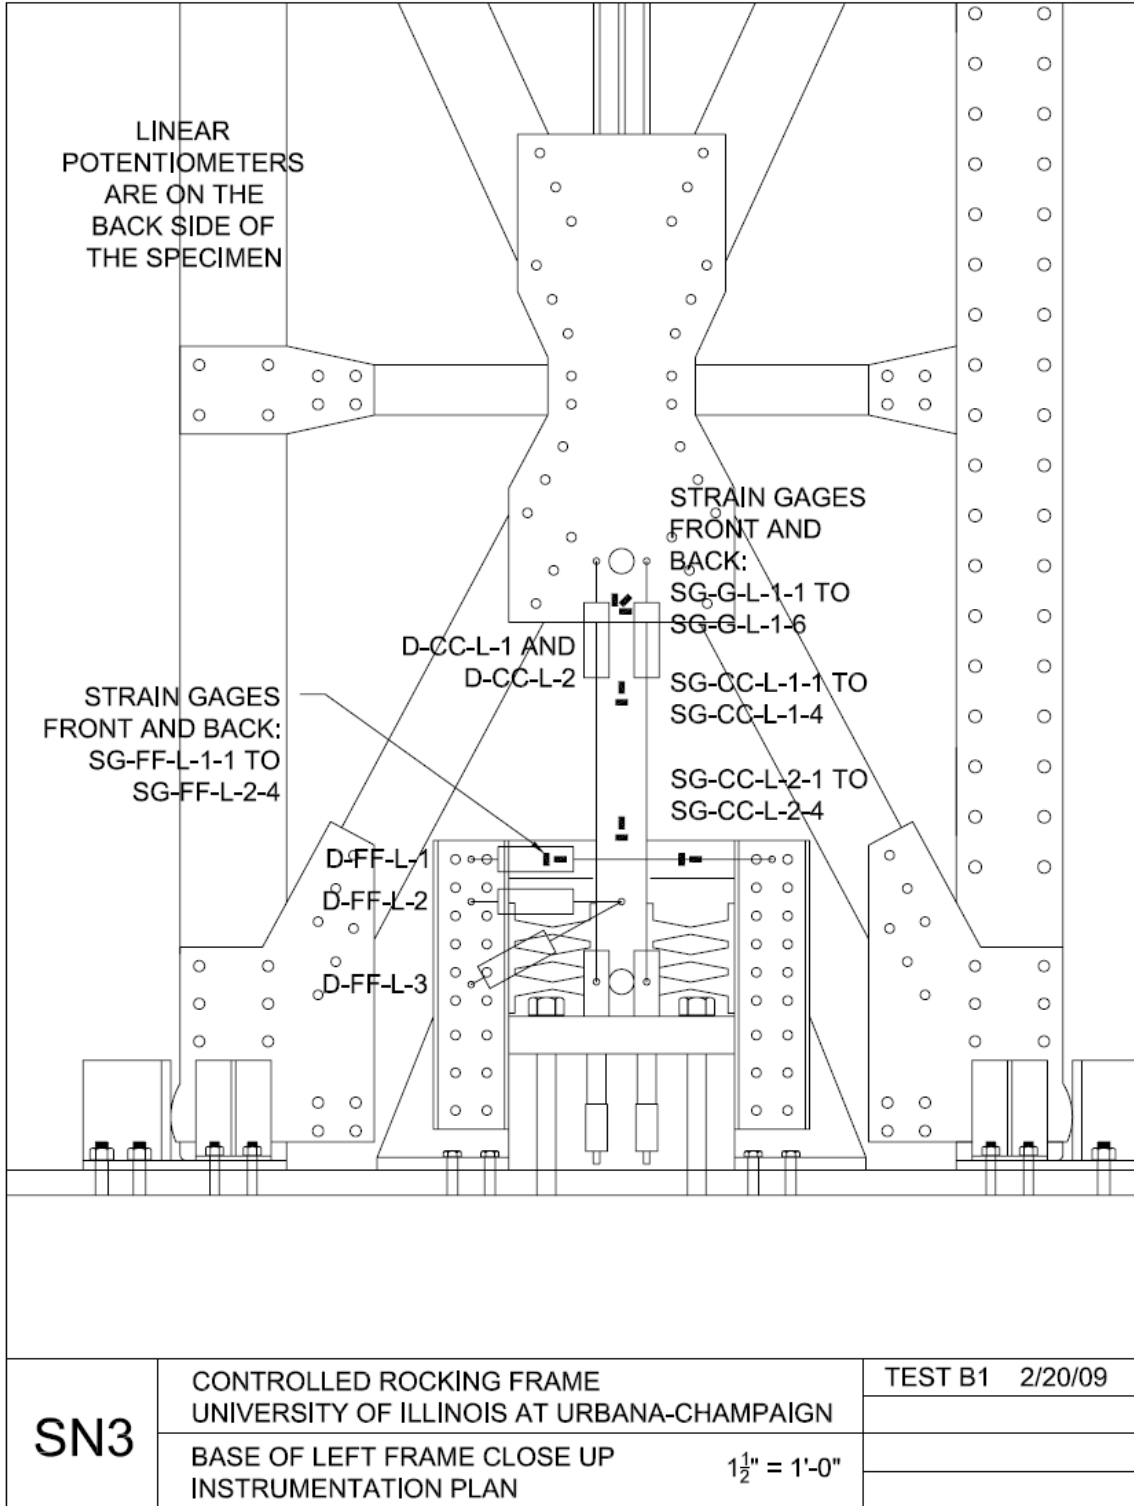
Single Frame Configuration Instrumentation Plan Drawing – Specimen B1
